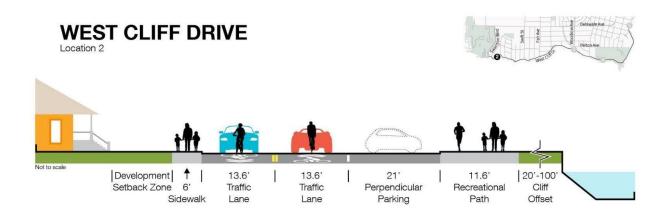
Cross Section of West Cliff Drive Alternative 1 Enhancements at Pyramid Beach parking lot
